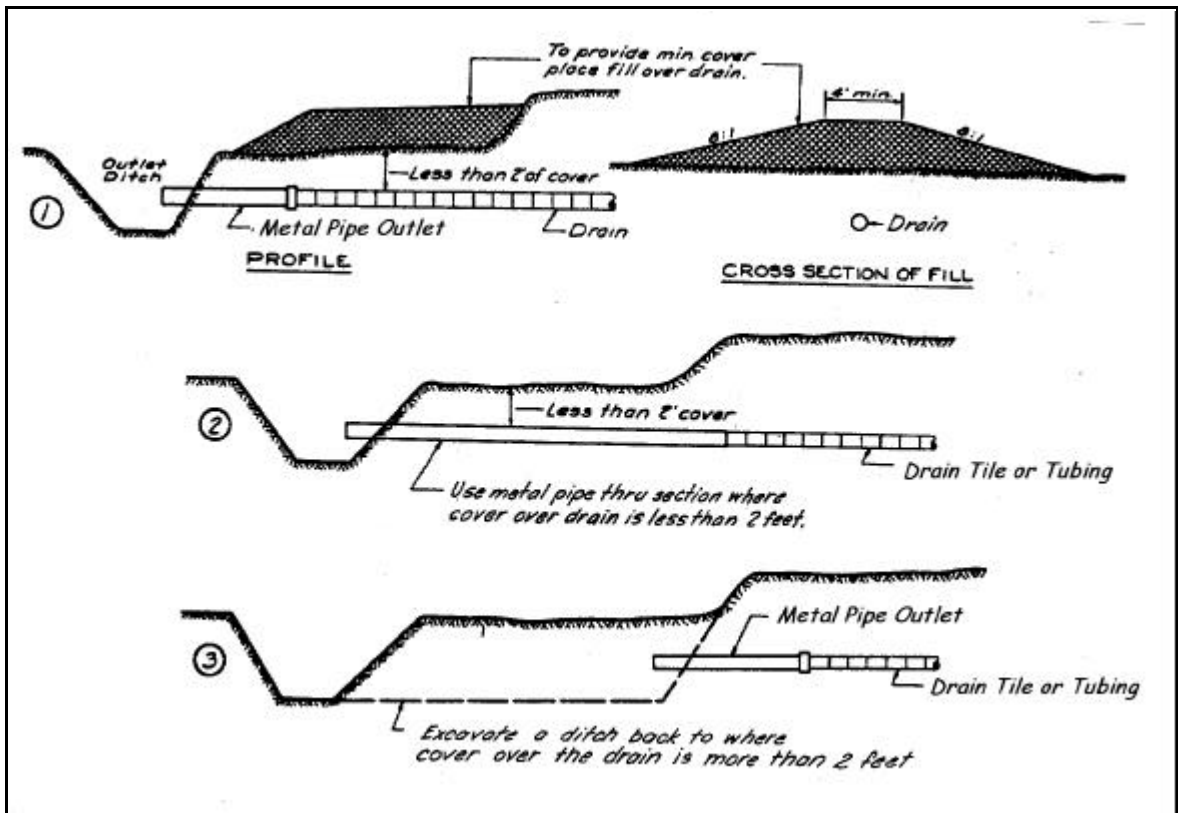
Methods for handling shallow depths at drain outlet (Source: NRCS Engineering Field Handbook)
